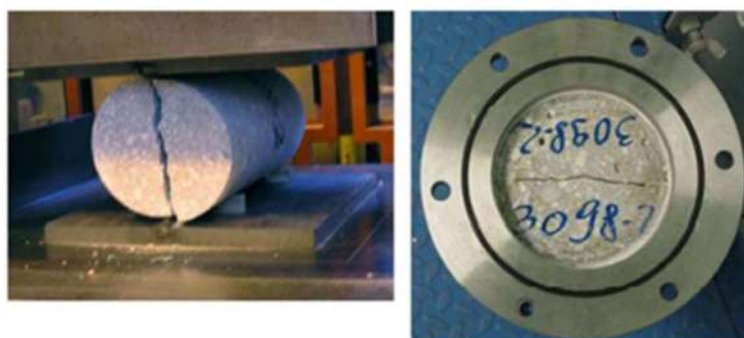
Instant of the splitting of one of the cylindrical samples (left), and view of the inlet of a crack sample positioned and sealed in the flanged steel holder (right).
